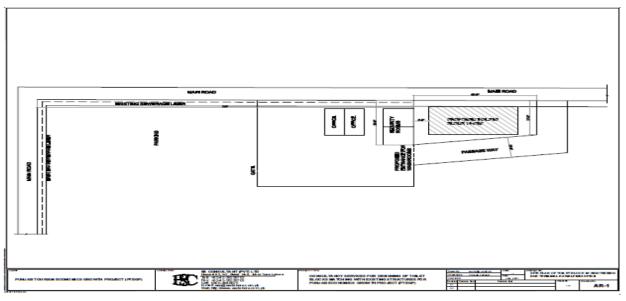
Proposed site for toilet blocks at TDCP sightseeing I & II
